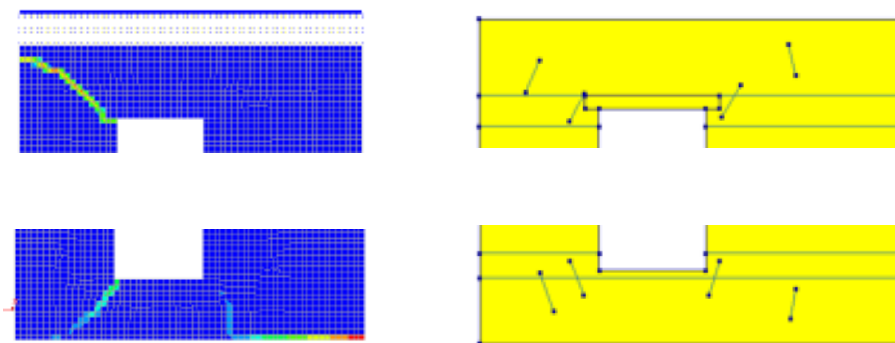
BJR just below and above the opening in order to prevent diagonal cracks
